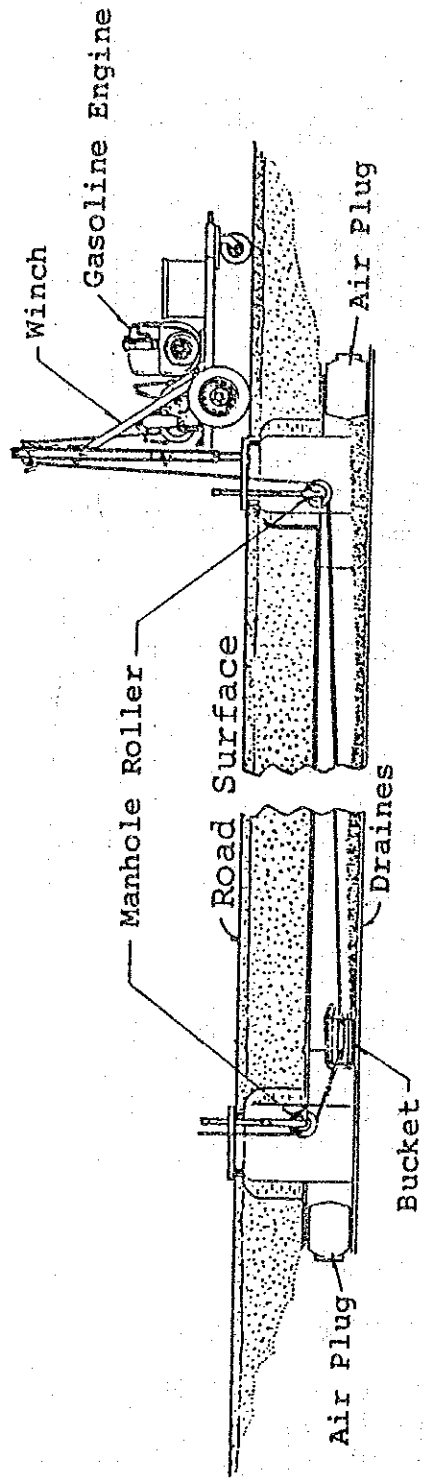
DRAINAGE PIPE CLEANING MACHINE
